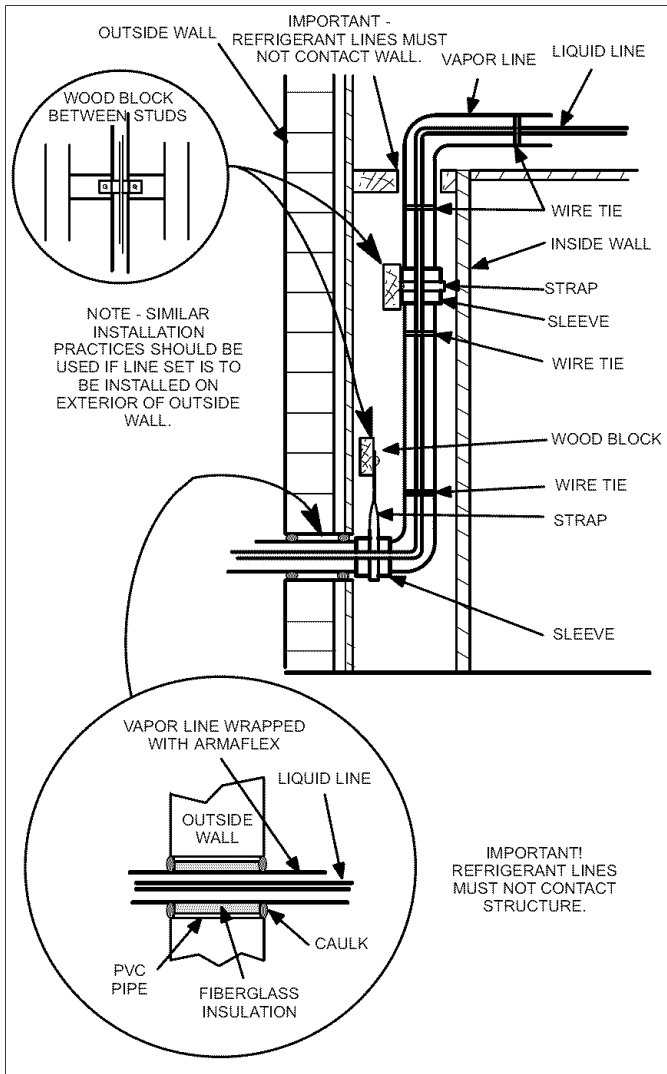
Refrigerant Line Sets: Installing Vertical Runs (New Construction Shown)
